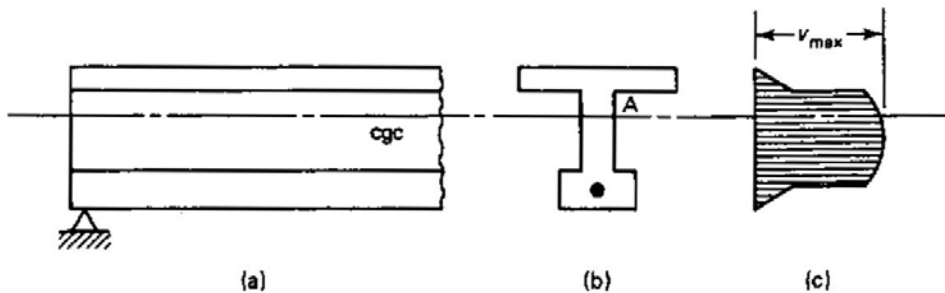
Maximum horizontal shear stress distribution across depth. (a) Beam elevation. (b) Beam cross section. (c) Shear stress.
